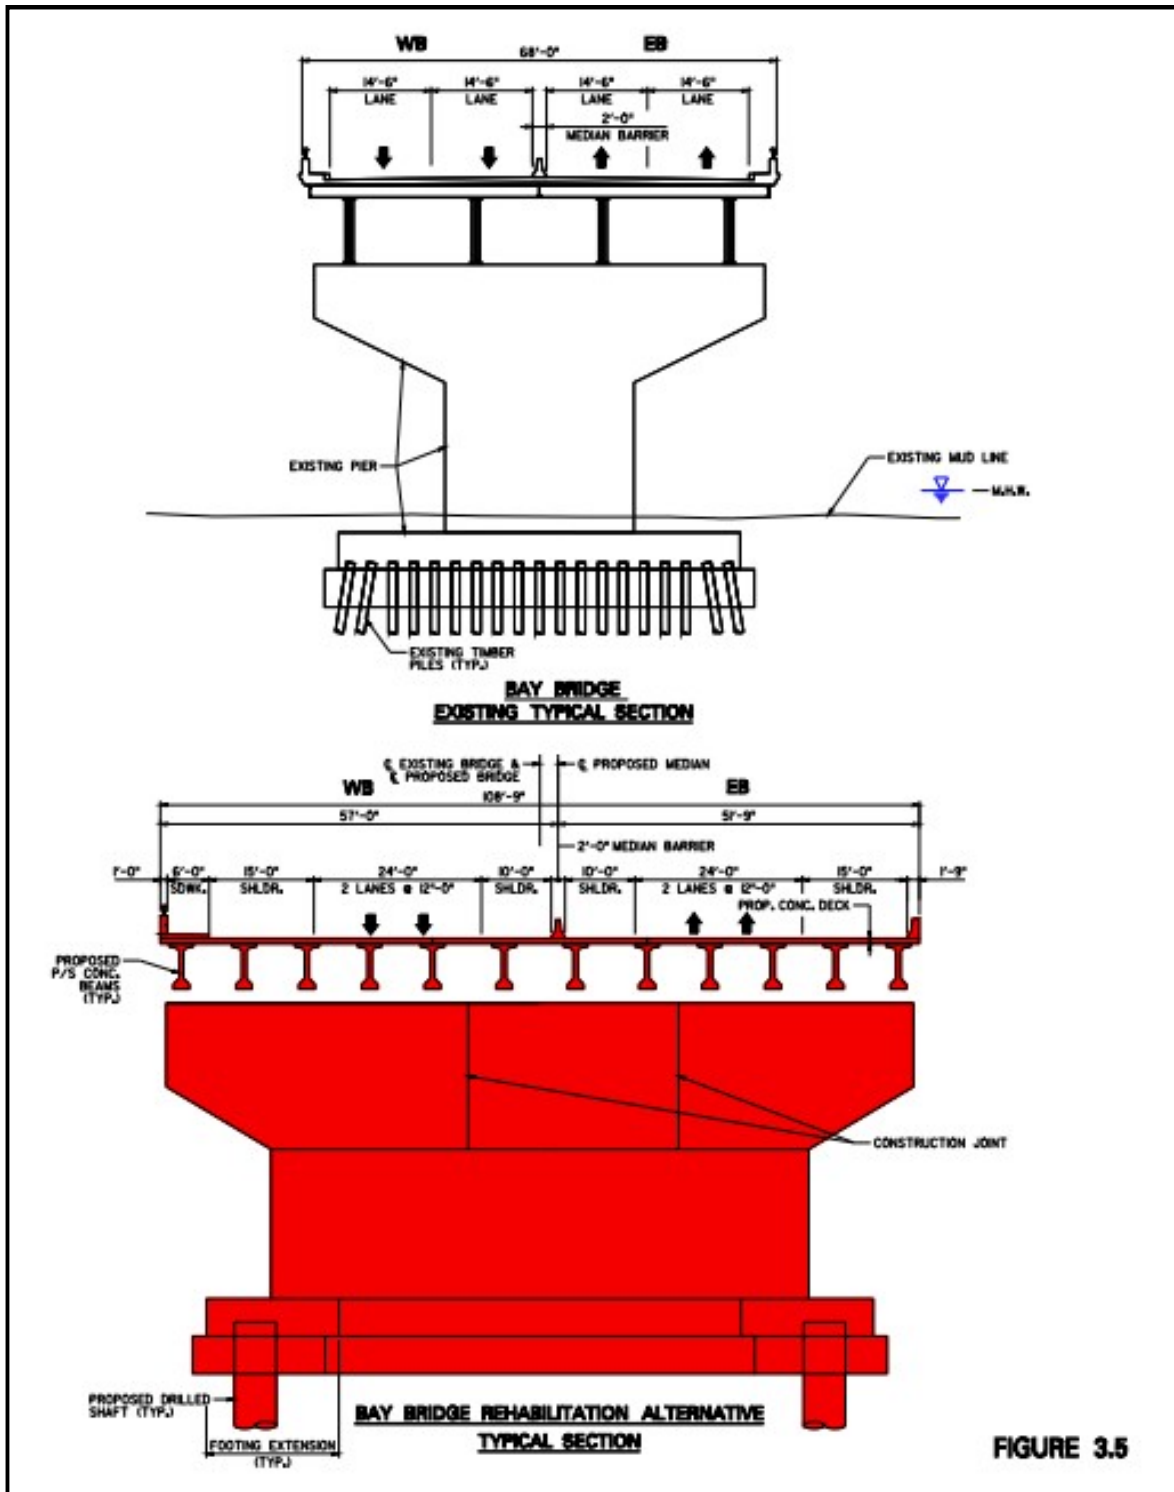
Bay Bridge Typical Section (Existing and Alternative 1 – Rehabilitation)
